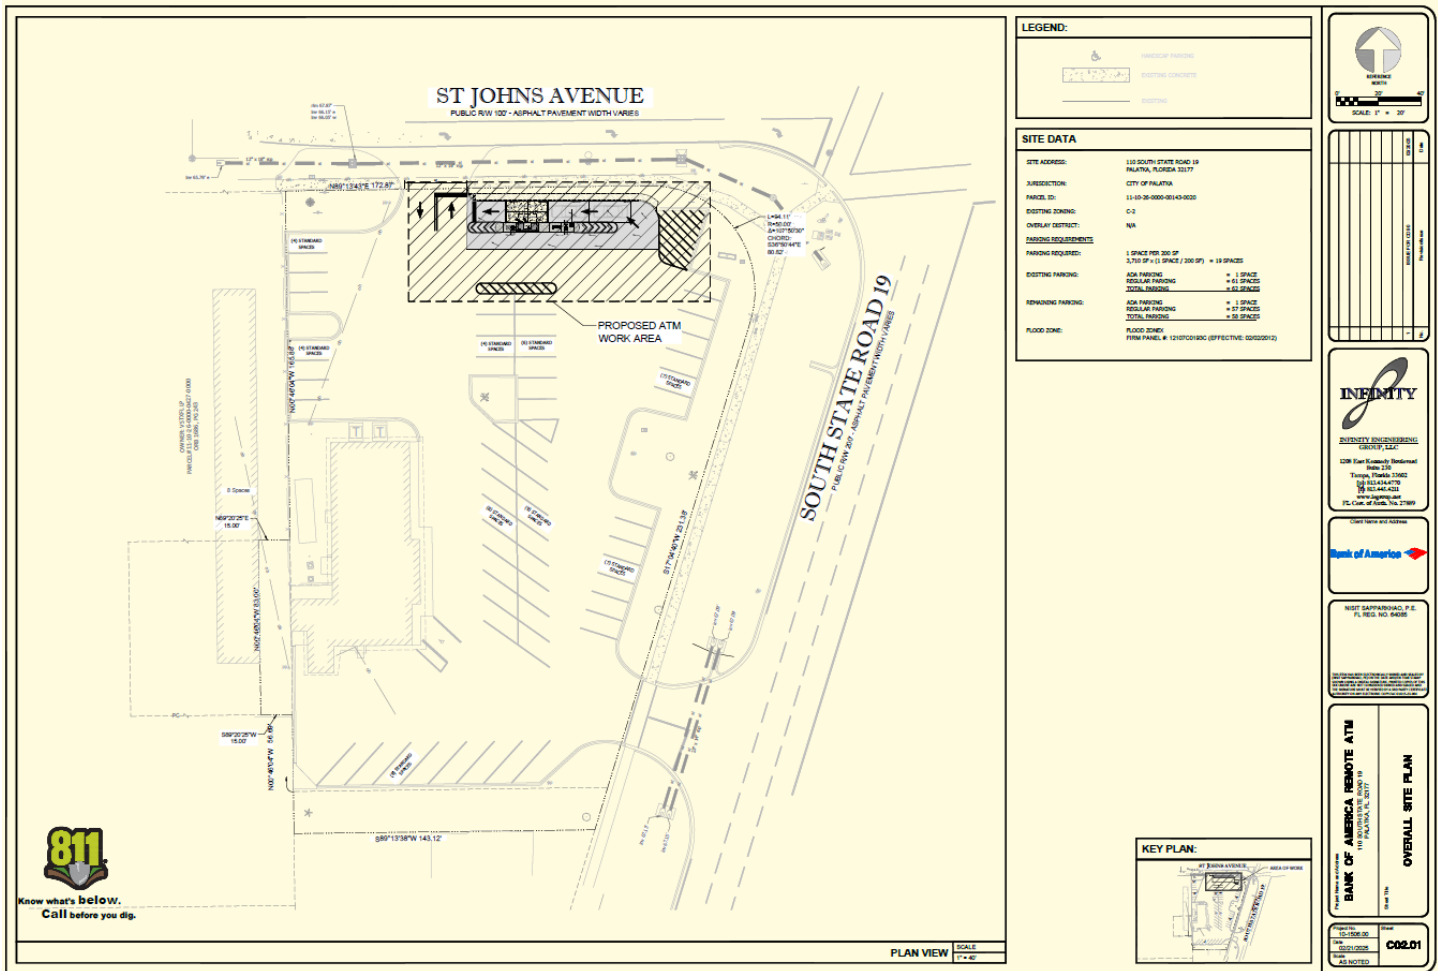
Site plan of proposed Bank of America drive-up ATM kiosk
